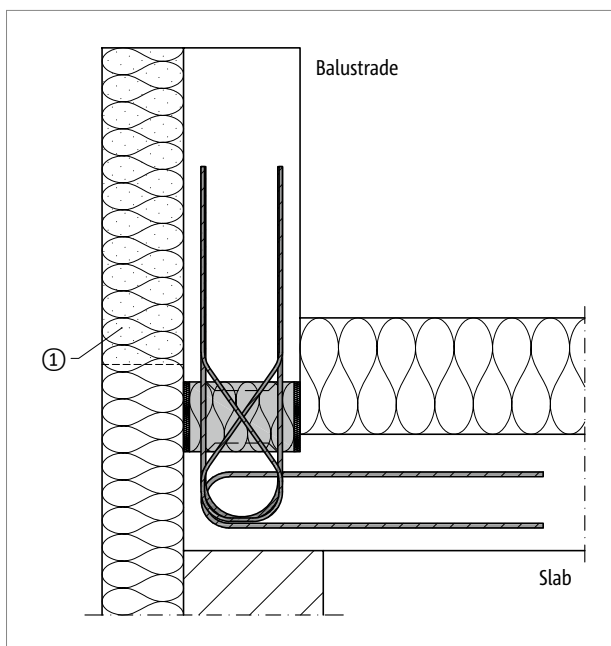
Schöck Isokorb® XT type A: Connection to a balustrade (type A-MM2-VV1)
